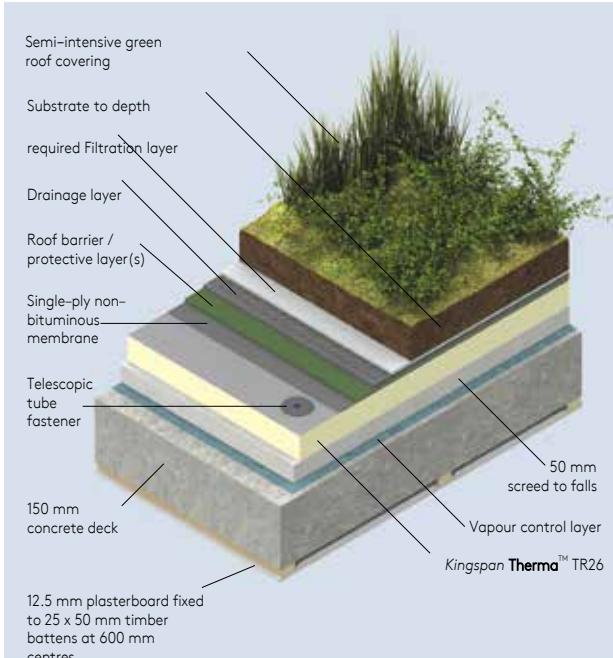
Kingspan Therma™ TR26 in a Semi-Intensive Green Roof Covering – Dense Concrete Deck with Suspended Ceiling
